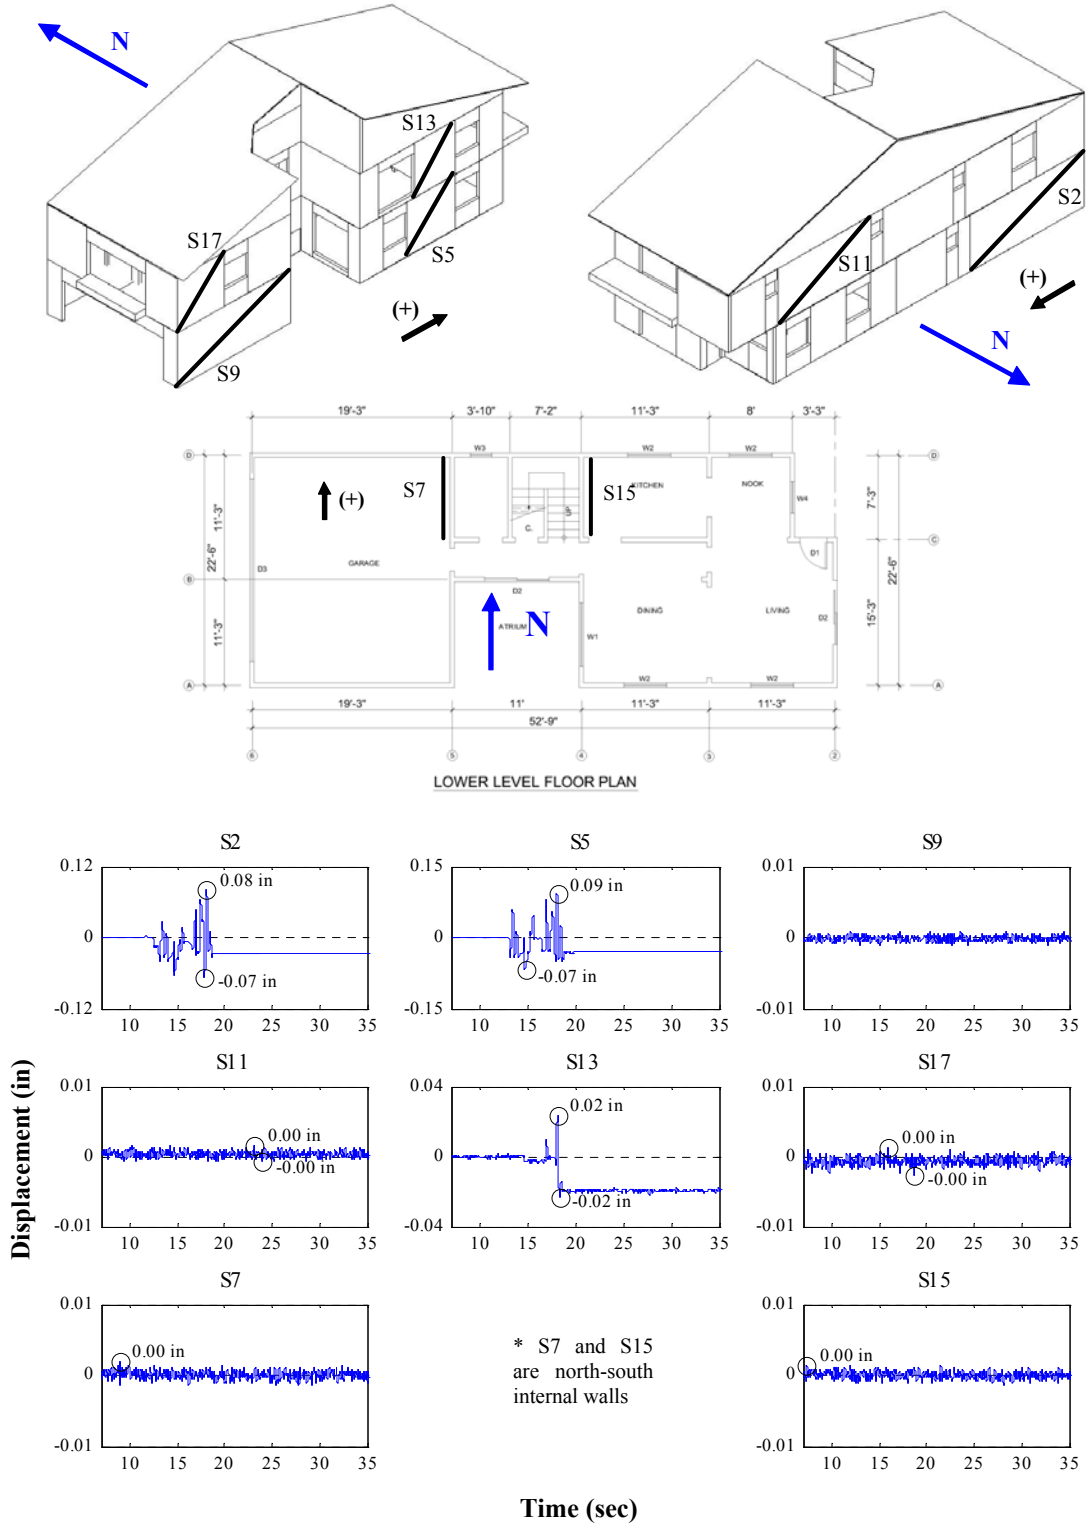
Wall deformations of east-west internal walls for Test NWP2S04
